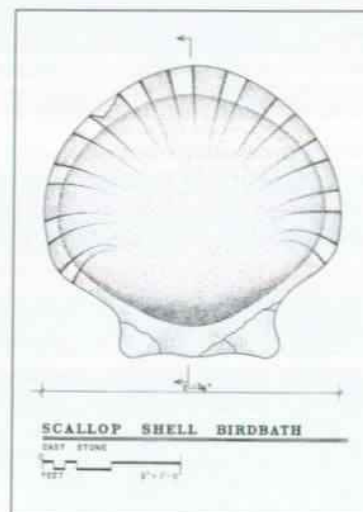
Detail drawing of the scallop shaped birdbath. Historic American Buildings Survey (HABS), Summer 1989. NCR Plans and Drawings Collection, # 863/80015 (Sheet 27 of 28).
